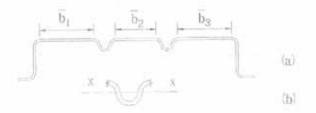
Sections with Multiple-Stiffened Compression Elements
